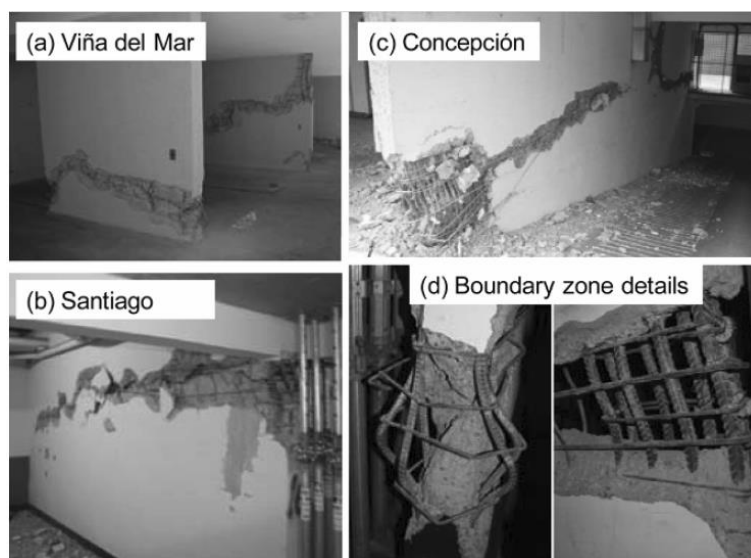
Typical Wall Damage in Chile Earthquake (Wallace 2012)
